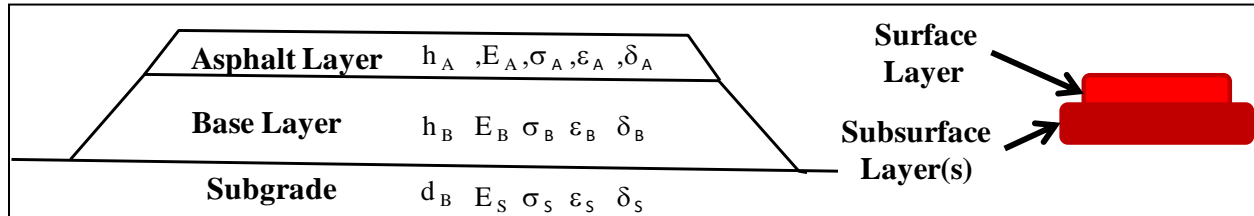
Typical cross-section in a Flexible Pavement Road and the Abstracted Icon for Pavement Structure
